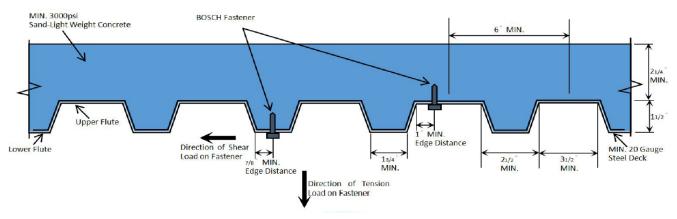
BOSCH FASTENER LOCATIONS IN 11/2-INCH-DEEP B-DECK PANEL
